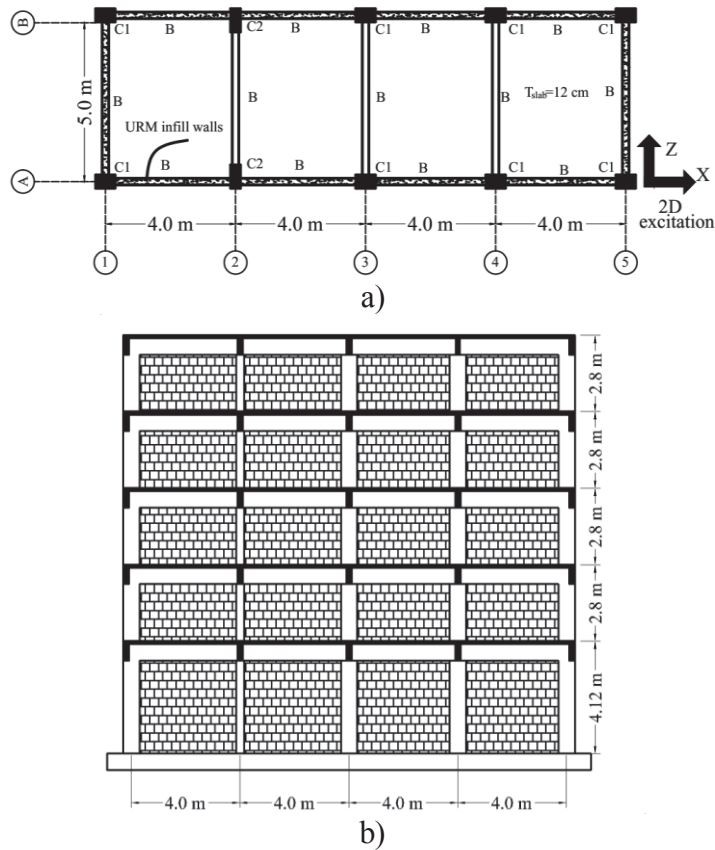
Case study 1 structure: a) plane layout, b) elevation view
